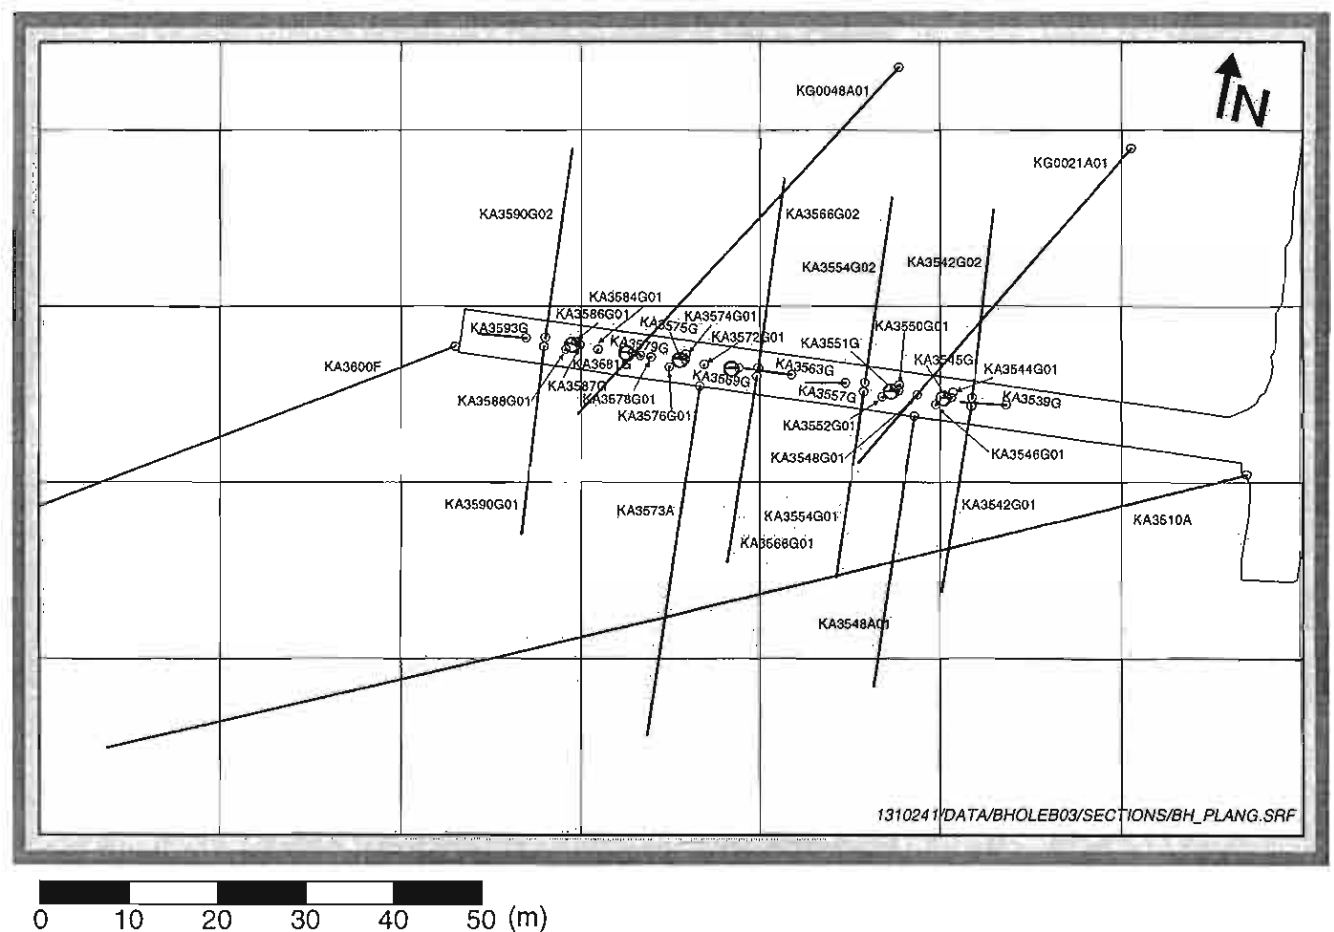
Location of the bore holes drilled during drill campaign 1, 2 & 3.
